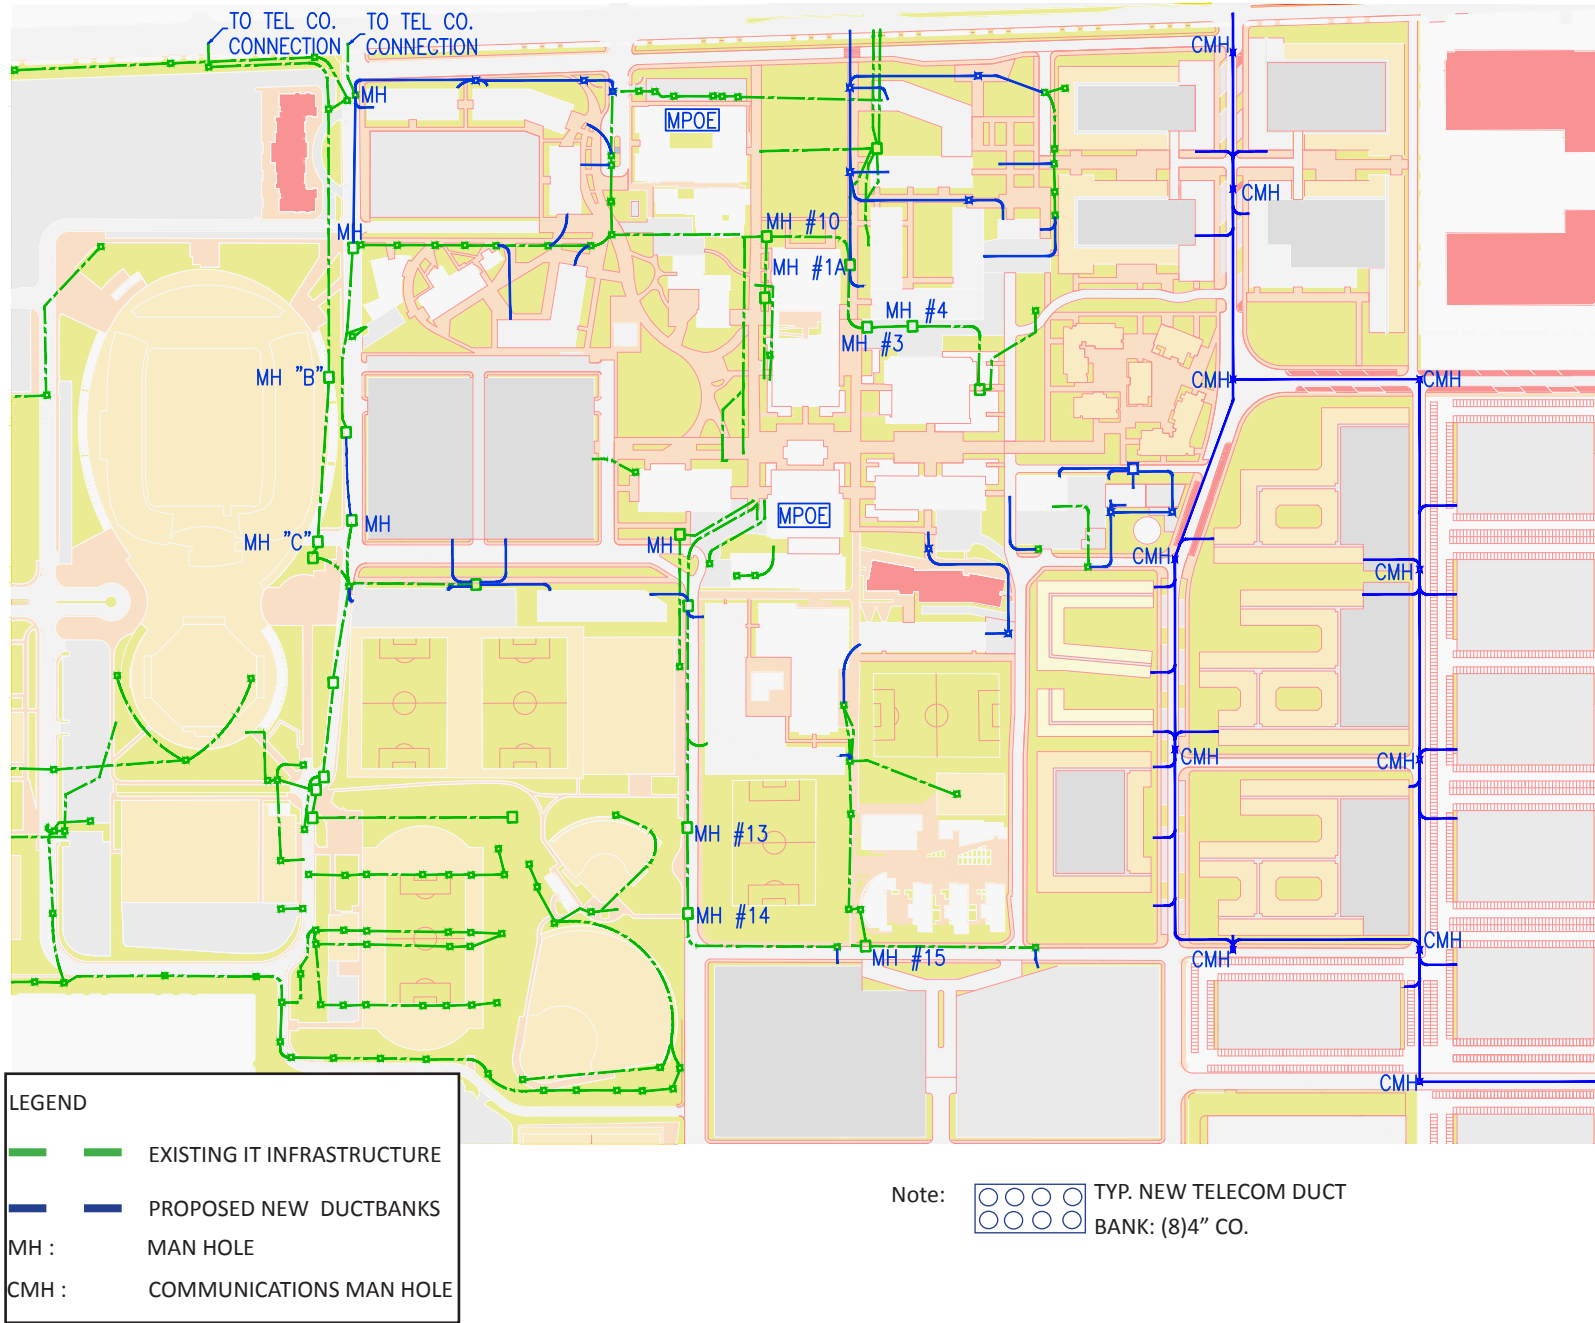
POTENTIAL BUILDING ROUTING FOR NEW DUCTBANKS TO REPLACE EXISTING CAMPUS IT INFRASTRUCTURE
